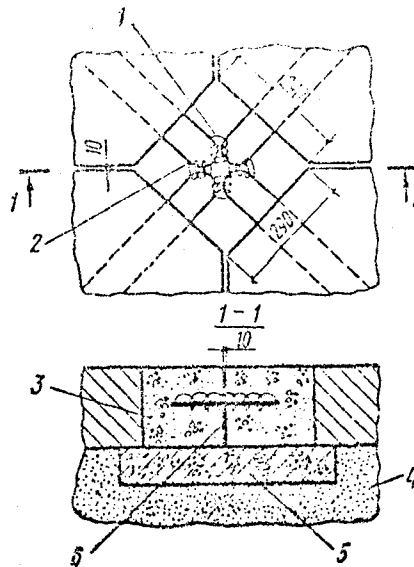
CONNECTION OF THE SLAB WITH THE AID OF REINFORCING LOOPS: 1: CONNECTED BY A WIRE; 2: REINFORCING LOOPS; 3: FILLING THE RECESSES WITH CONCRETE; 4: SANDY BASE; 5: STANDARD SLABS 50 x 50 x 8 cm; 6: POURING OF THE JUNCTIONS WITH CLAY-BITUMEN PASTE
